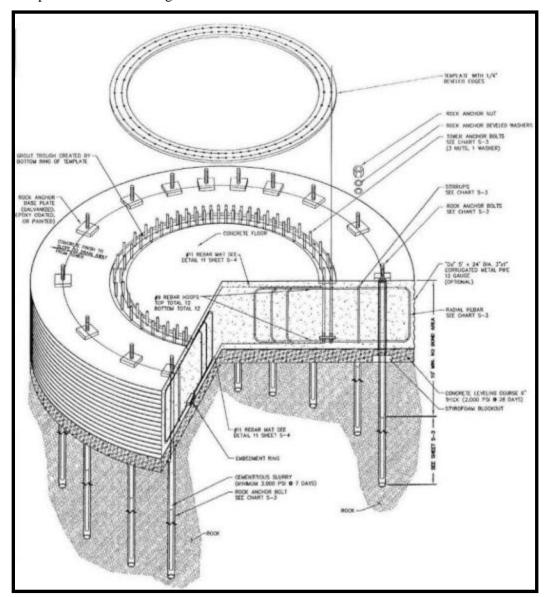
Typical WTG Rock Anchor Foundation
